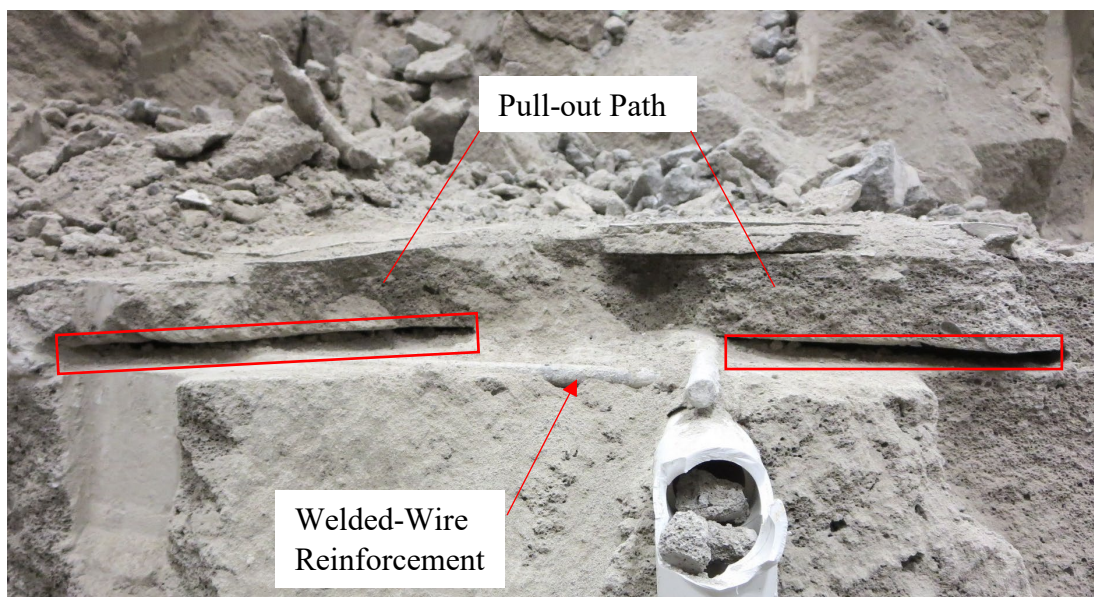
Photograph showing welded-wire reinforcement path after pull-out test.
